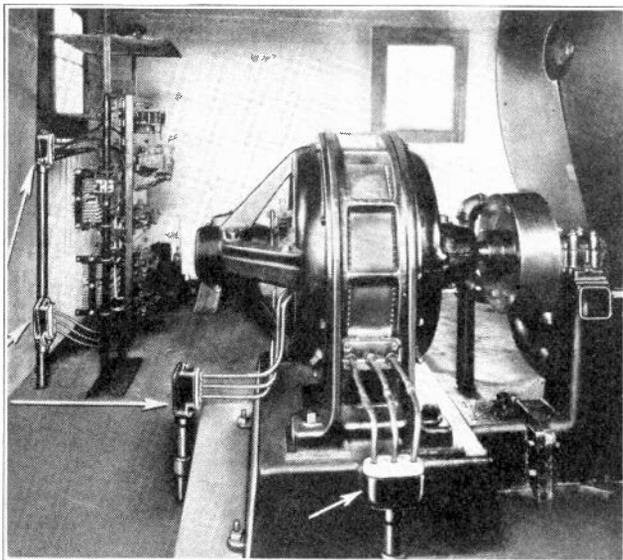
This photo shows a very neat installation of the wiring to a slip ring motor and its controller. Courtesy of Crouse Hinds Co.
